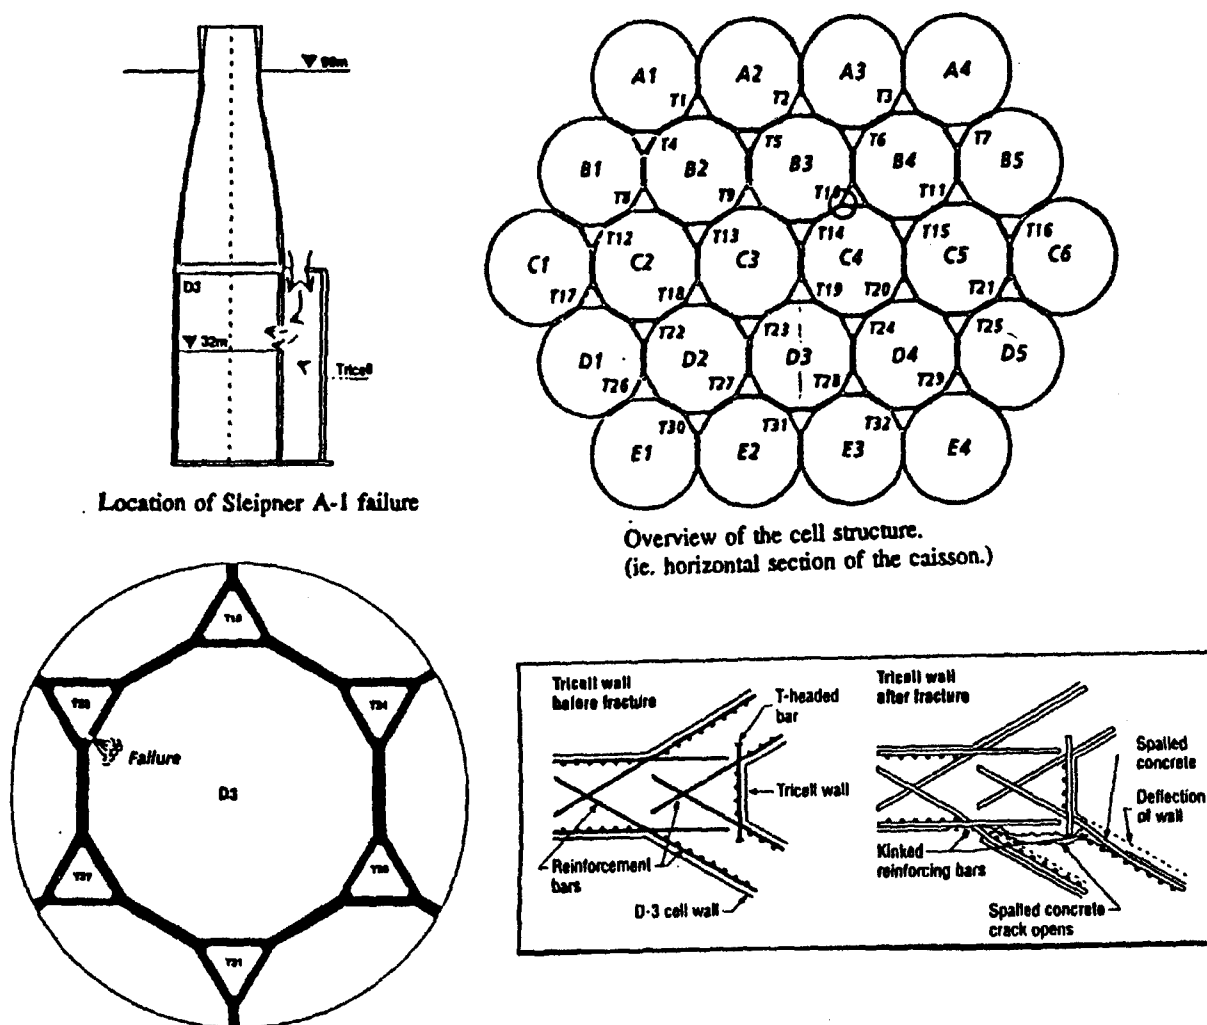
Details of the Sleipner GBS base cells and tri-cell intersection reinforcement and failure
